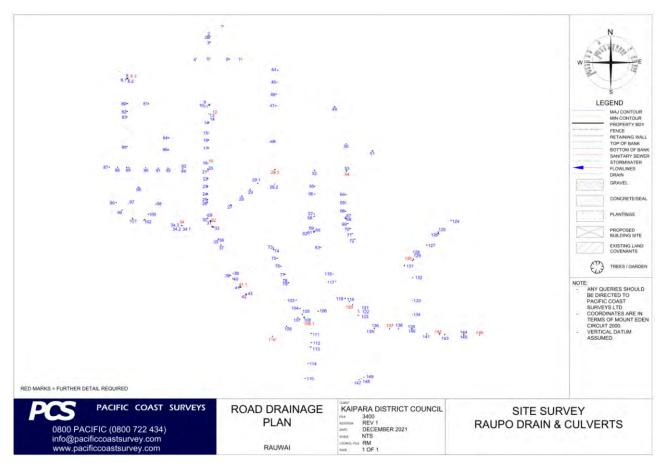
Road Drainage Plan – Raupo Drains and Culvert Locations
